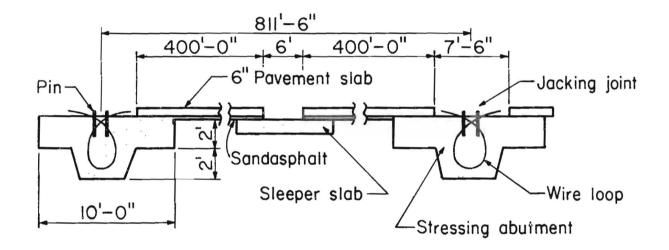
PRESTRESSED CONCRETE RUNWAY AT VIENNA, AUSTRIA
